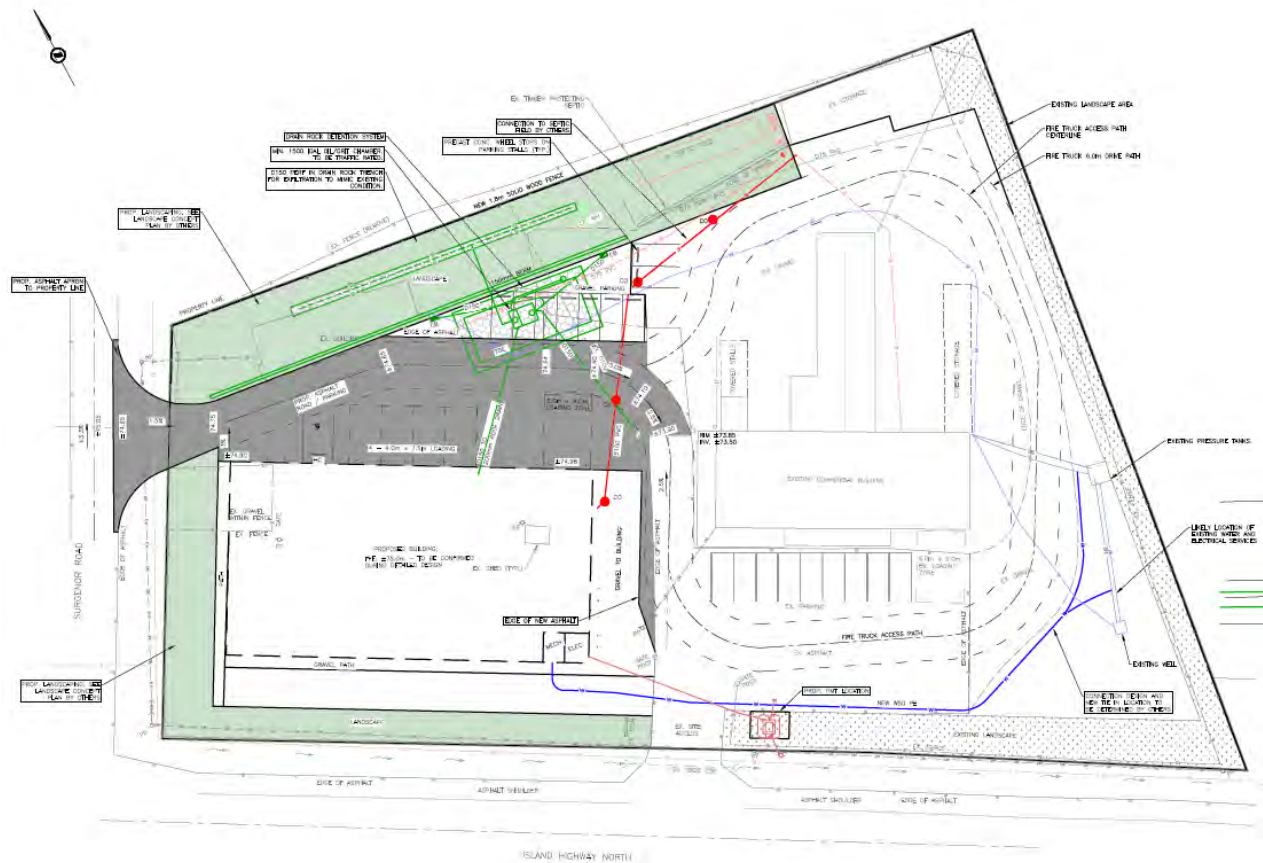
Site Plan from Development Permit (File DP 7C 22)
